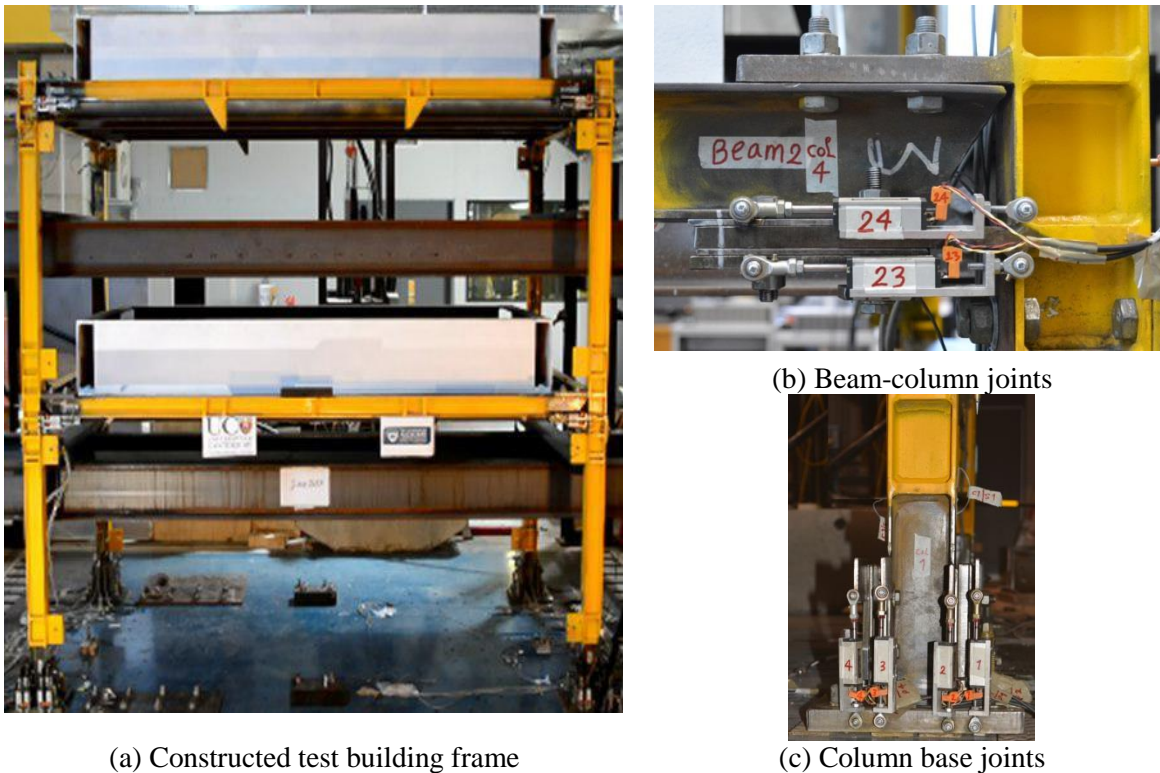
Test building constructed frame. Two steel frames with asymmetric friction connections (AFC) in the column base and beam-to-column joints.
